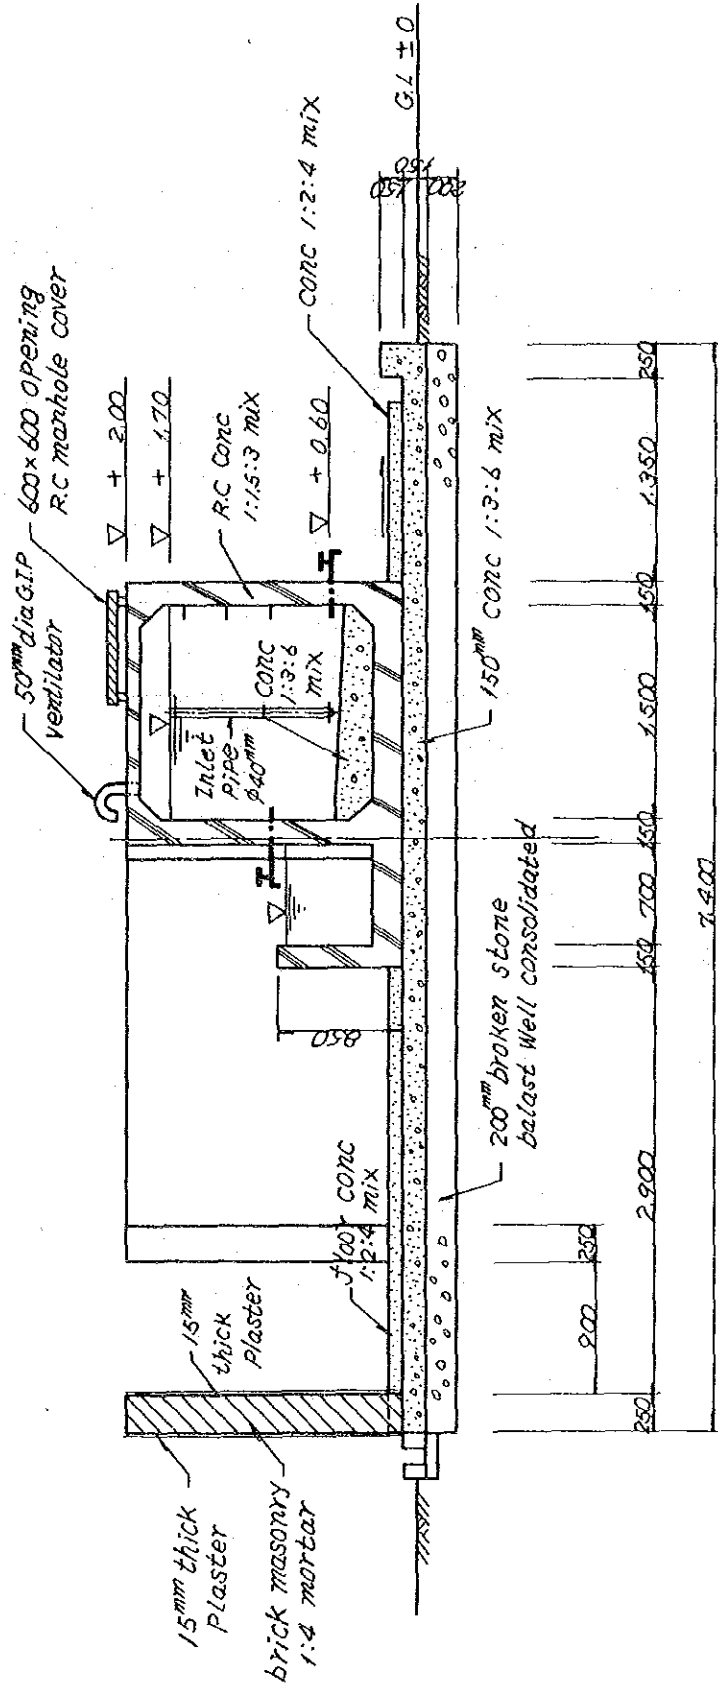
A-A SECTION OF TYPE-C FACILITY S=1/50
